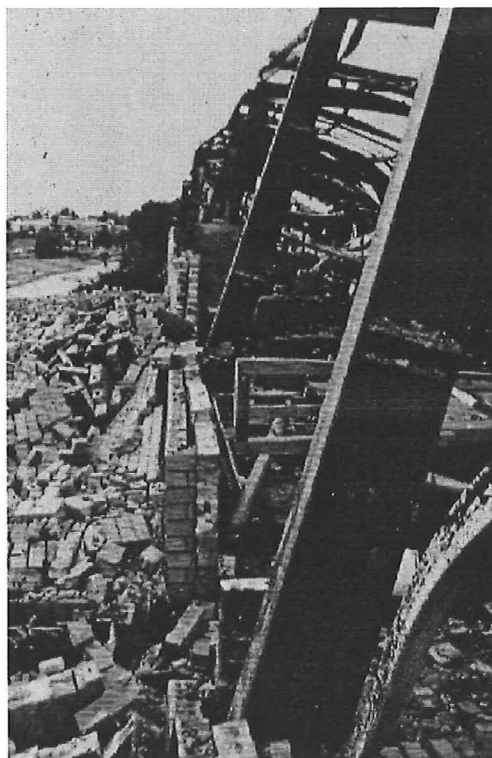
Outward collapse of brick walls due to thermal bowing.
